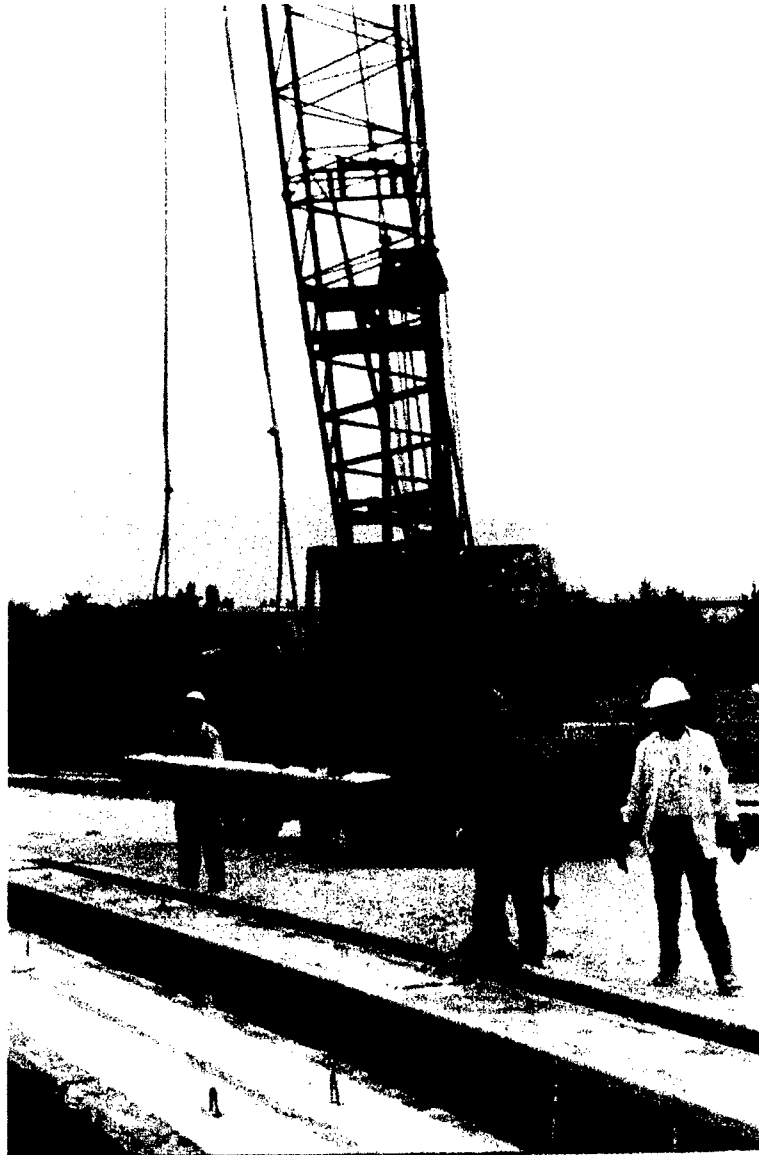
Removal of CFRP pretensioned concrete piles for storage
